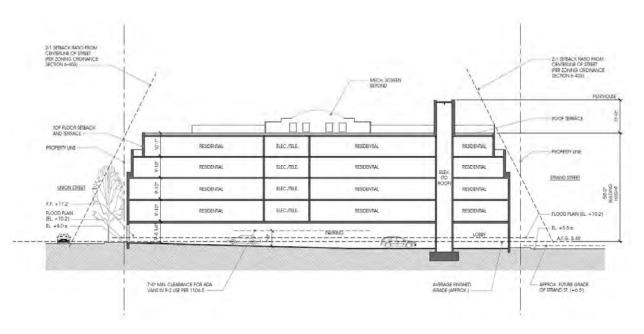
Proposed Building Cross-Section at 211 Strand Street (Rust Orling Architecture; COA Application for BAR Case No. 2016-00268)
